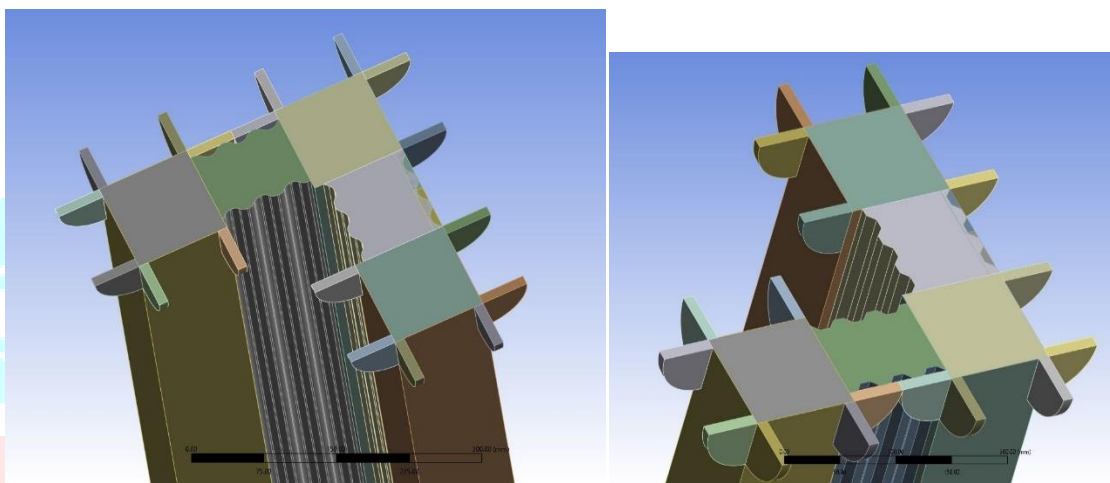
L-shaped CFST Column with trapezoidal Sinusoidal Corrugated Steel Plates
